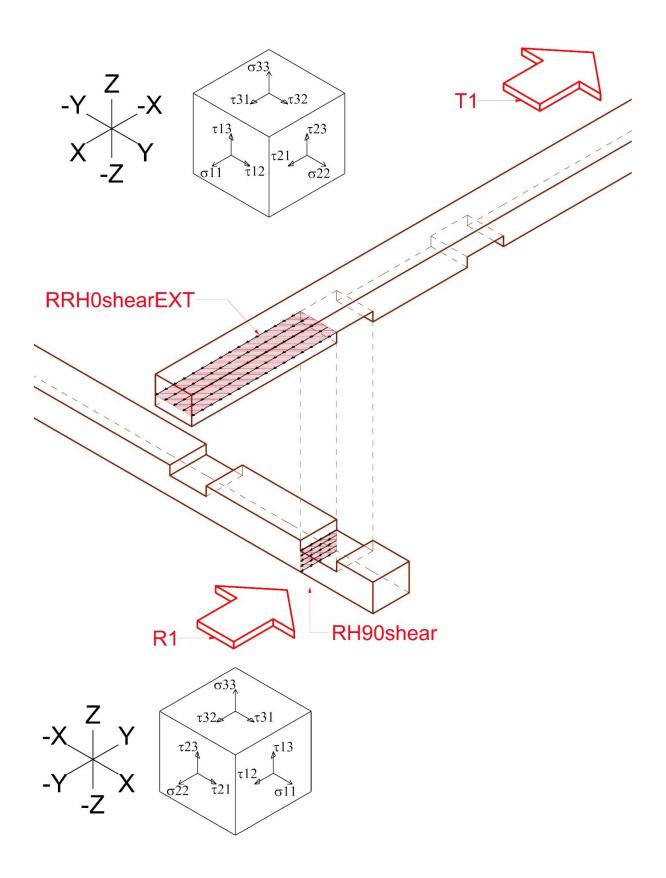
Roof Rafter Head Tangential stresses: Crossing rafters T1-R1
